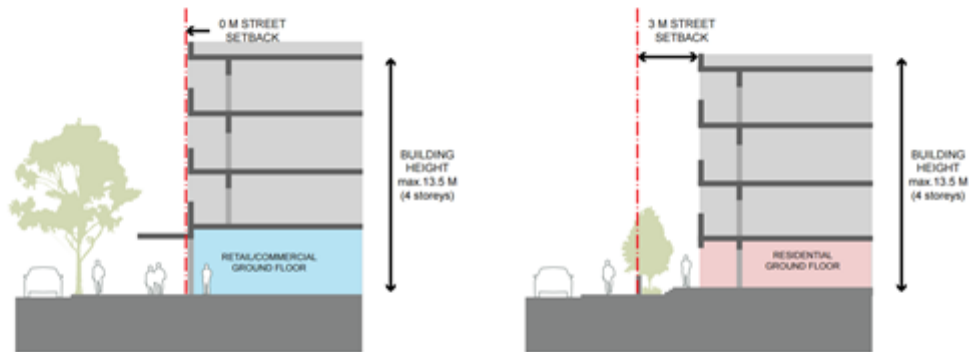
Front setbacks for retail/commercial ground floor and residential ground floor
